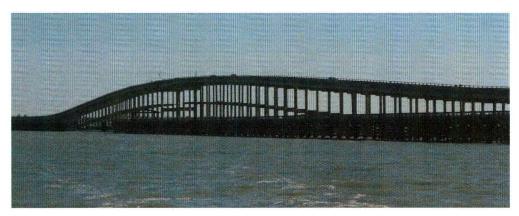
Copano Bay Bridge (Looking Northeast)
